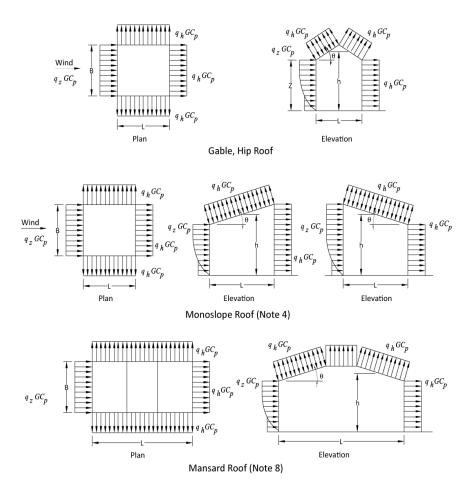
Enclosed, Partially Enclosed Buildings; Walls & Roofs
